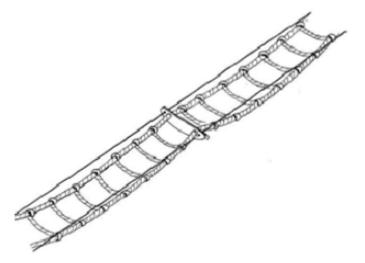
Rope ladder style canopy bridge overpass (from DTMR Design Manual Volume 2 (2010)
